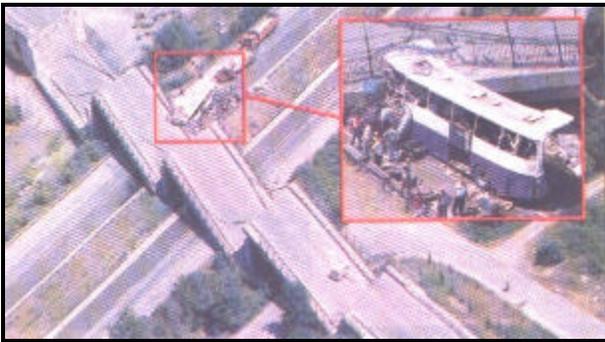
Failure of a prestressed concrete box beam bridge after Izmit EQ 1999 (10)
